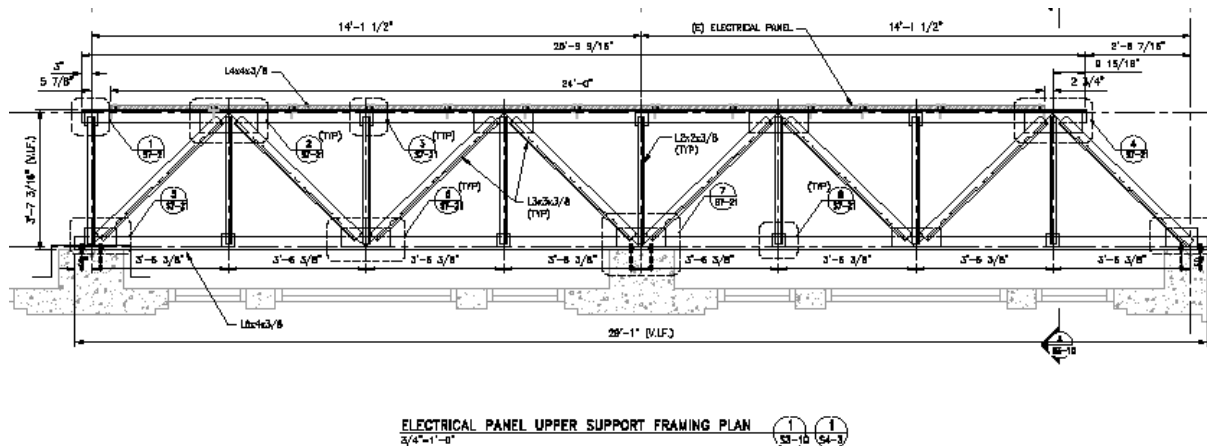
Proposed electrical panel support framing plan. Framing would be constructed between the panel (top of exhibit) and the eastern wall of the facility (bottom of exhibit).
